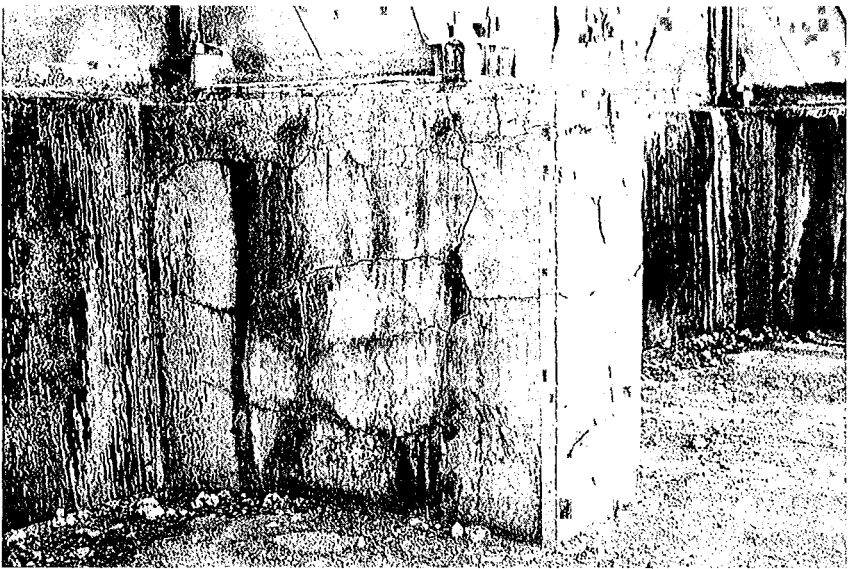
Second replacement of adjacent PCC structural pier severely damaged after only 2½ years
